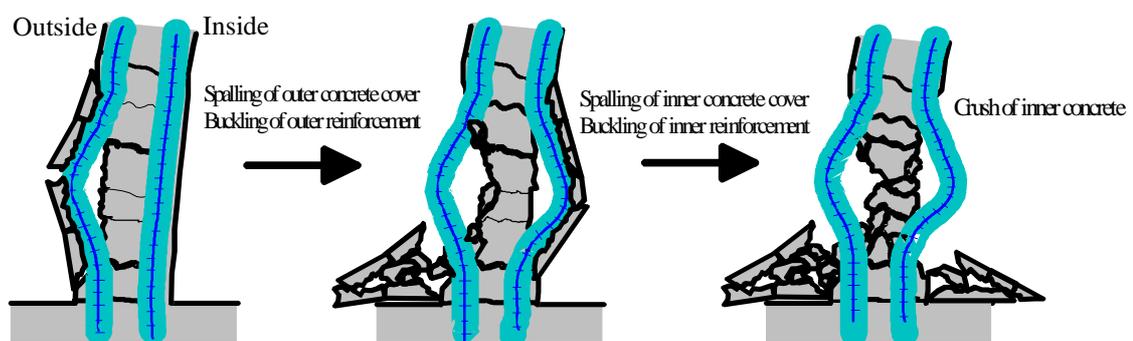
Progress of failure at compressive flanges of a RC member with a hollow section
